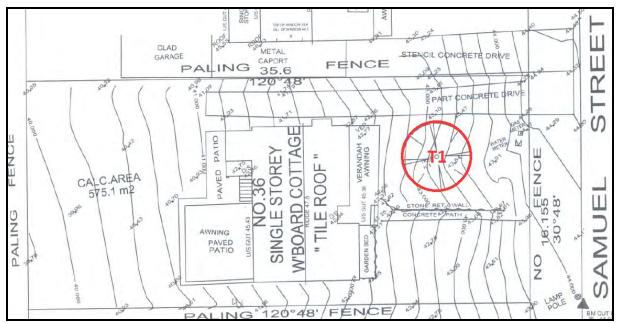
Submitted survey plan showing tree proposed to be removed. Source: Submitted survey plan edited by CPS Landscape Architect
